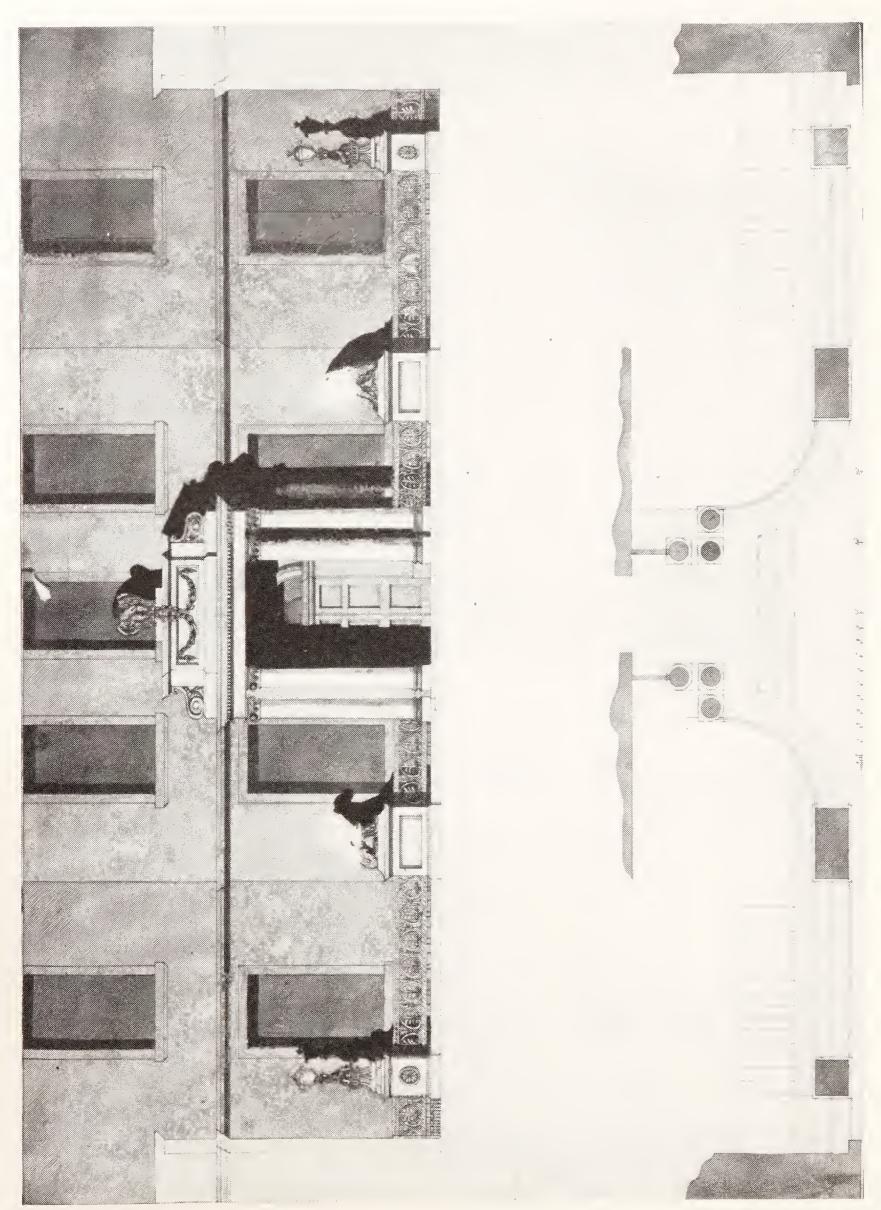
William Belwood, design for a new entrance porch and area, Newby Hall, c.1776.
